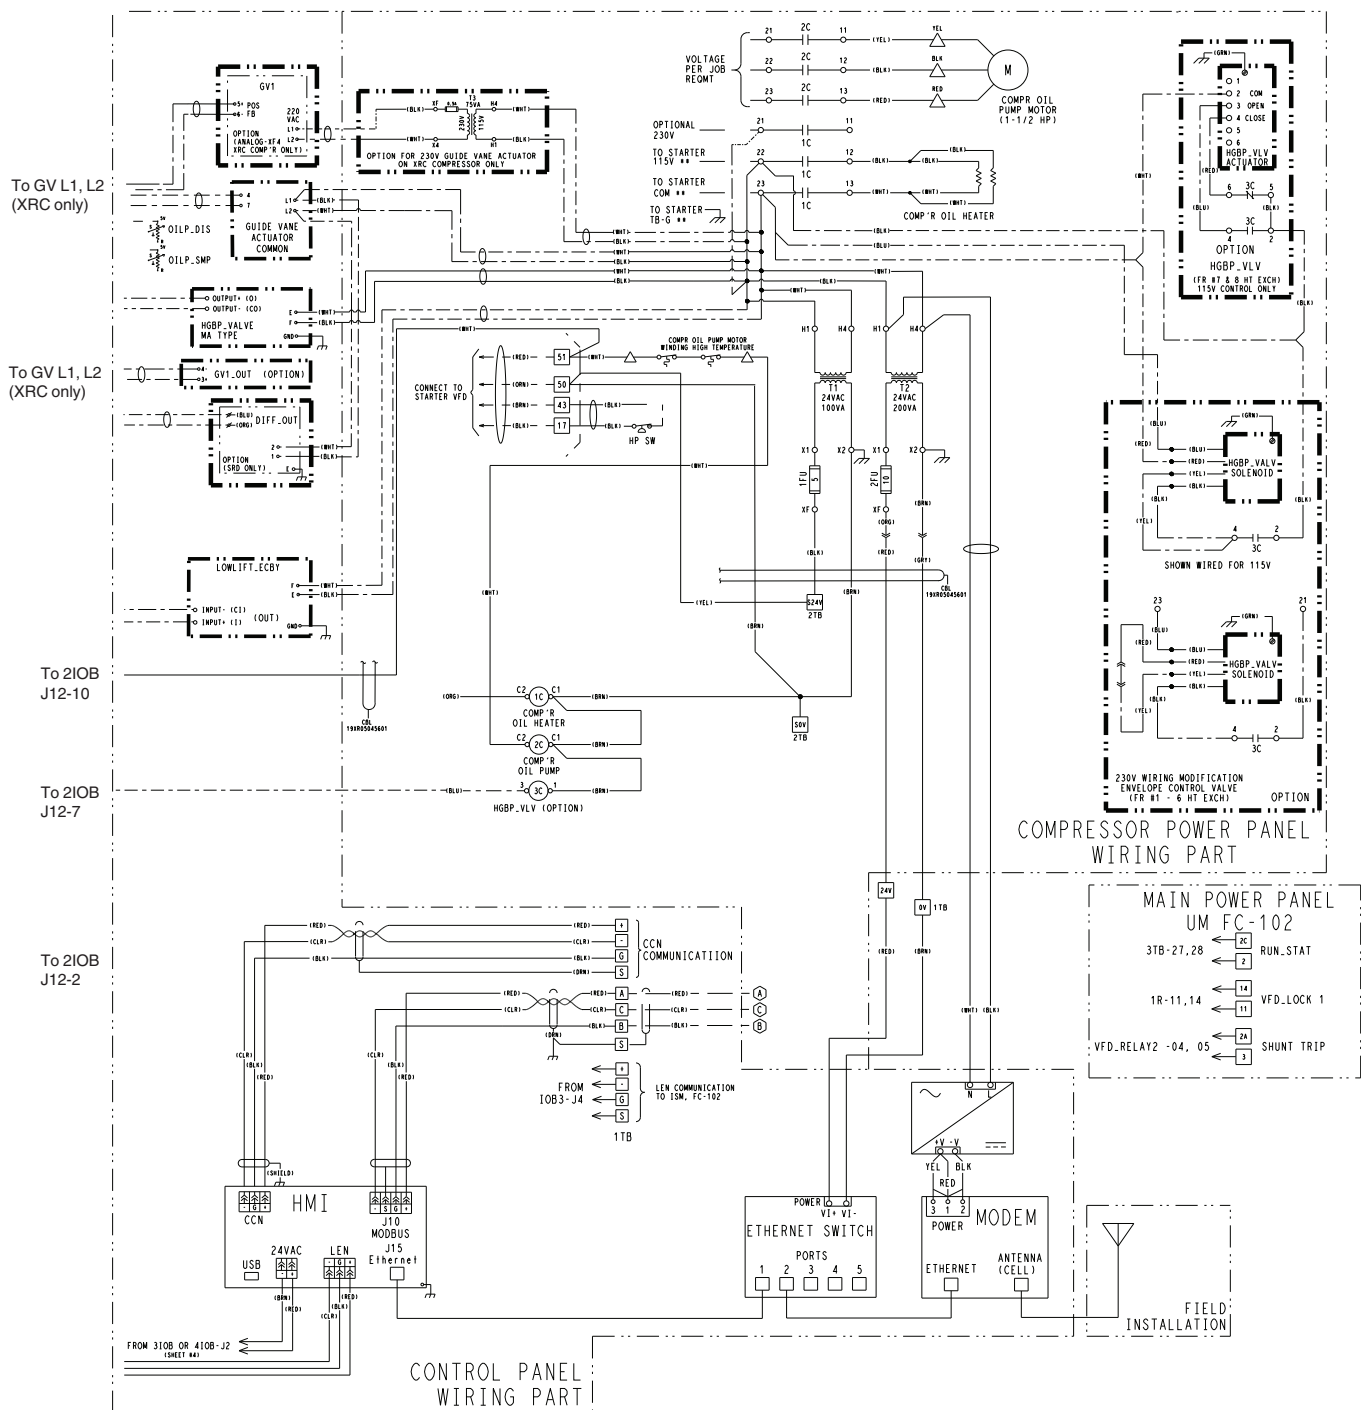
19XR3-E Chiller Control Schematic for Unit Mount VFD Chiller
